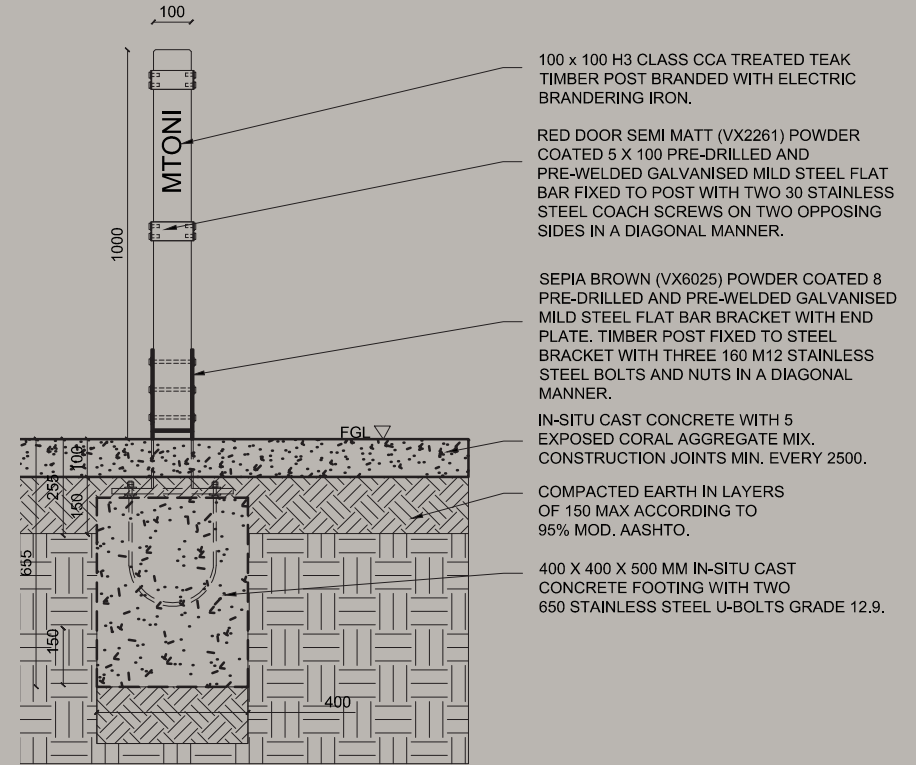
Detail Section (1:20) of Bollard (Author, 2014).
